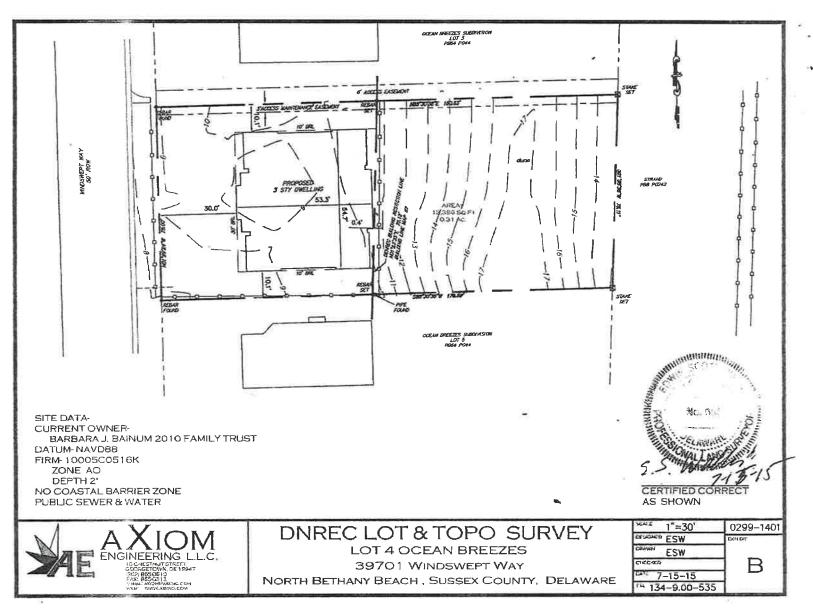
Plan view survey (prepared by Axiom Engineering, L.L.C.) showing "footprint" of proposed dwelling, topographic contours at 1' intervals, and DNREC Building Line. Entire structure will be located landward of Building Line.
